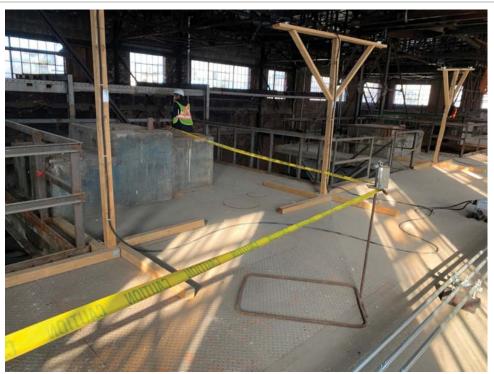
Mezzanine – Plated areas blocked off. Blocked off as determined not suitable for traffic. Repairs of these areas could be needed to open again.
